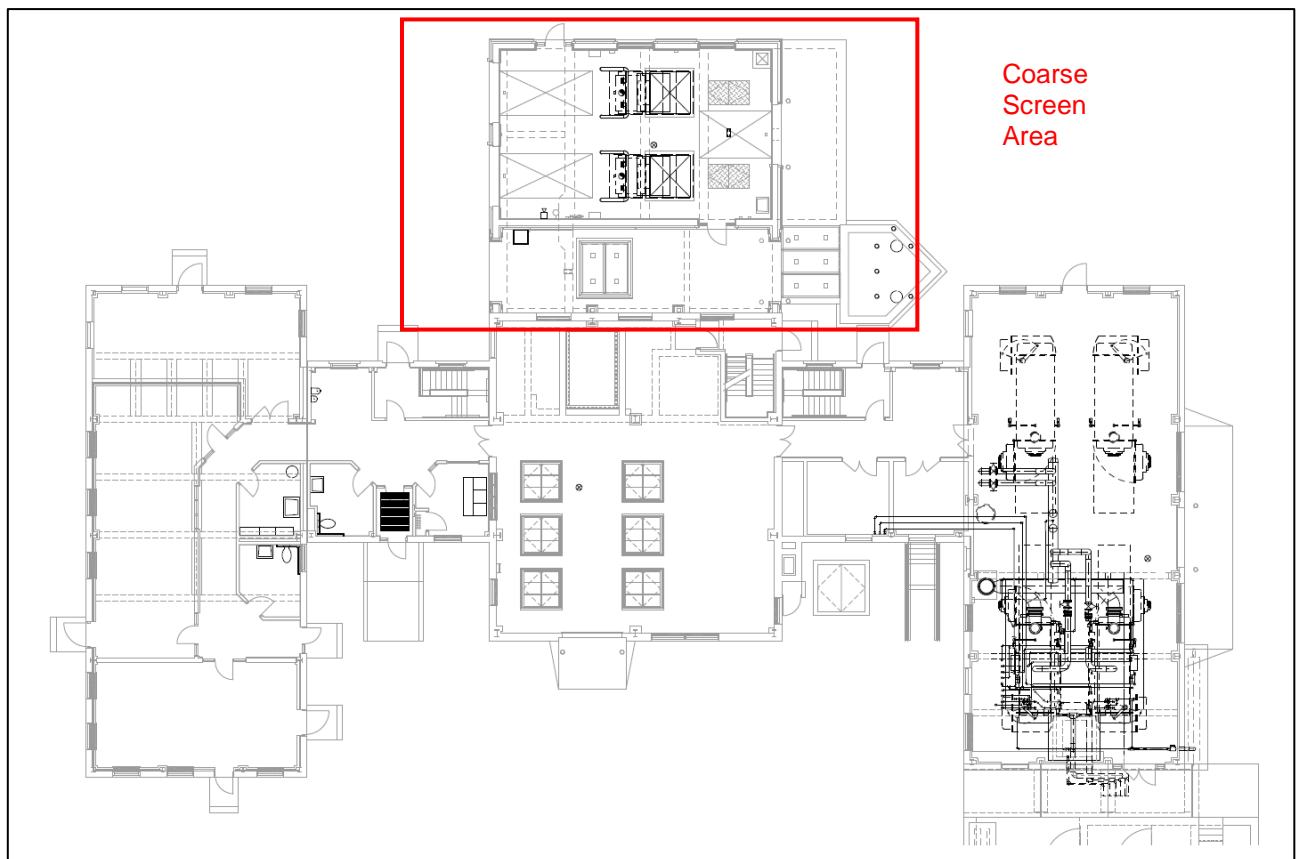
Existing Building A Plan with Coarse Screen Area Highlighted
